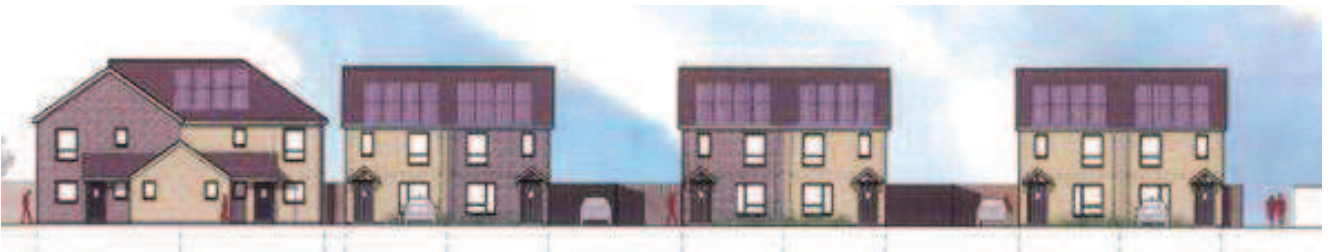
Scheme refused (Ref No. P/15/568/FUL)
